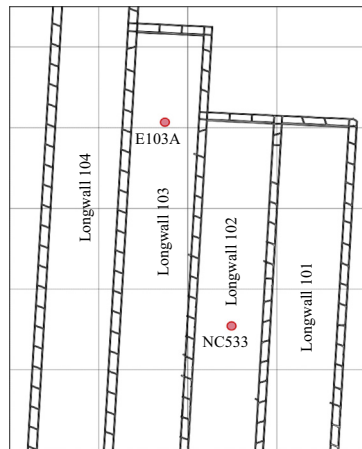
Site Plan shown location of inclinometer boreholes relative to longwall panels.
